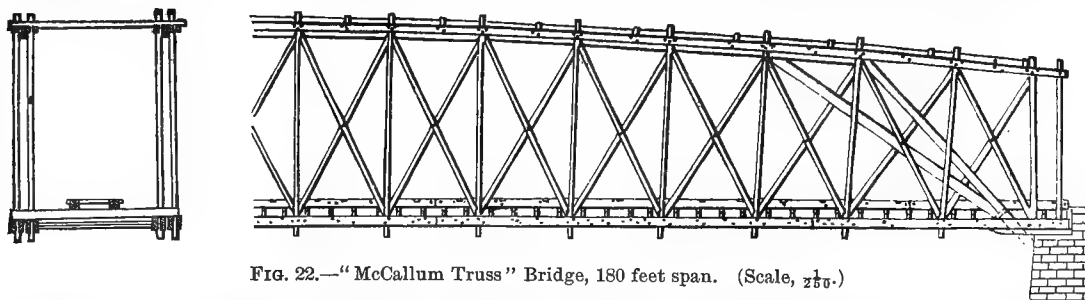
"McCallum Truss" Bridge, 180 feet span. (Scale, $\frac{1}{2}$ inch = 1 foot.)
